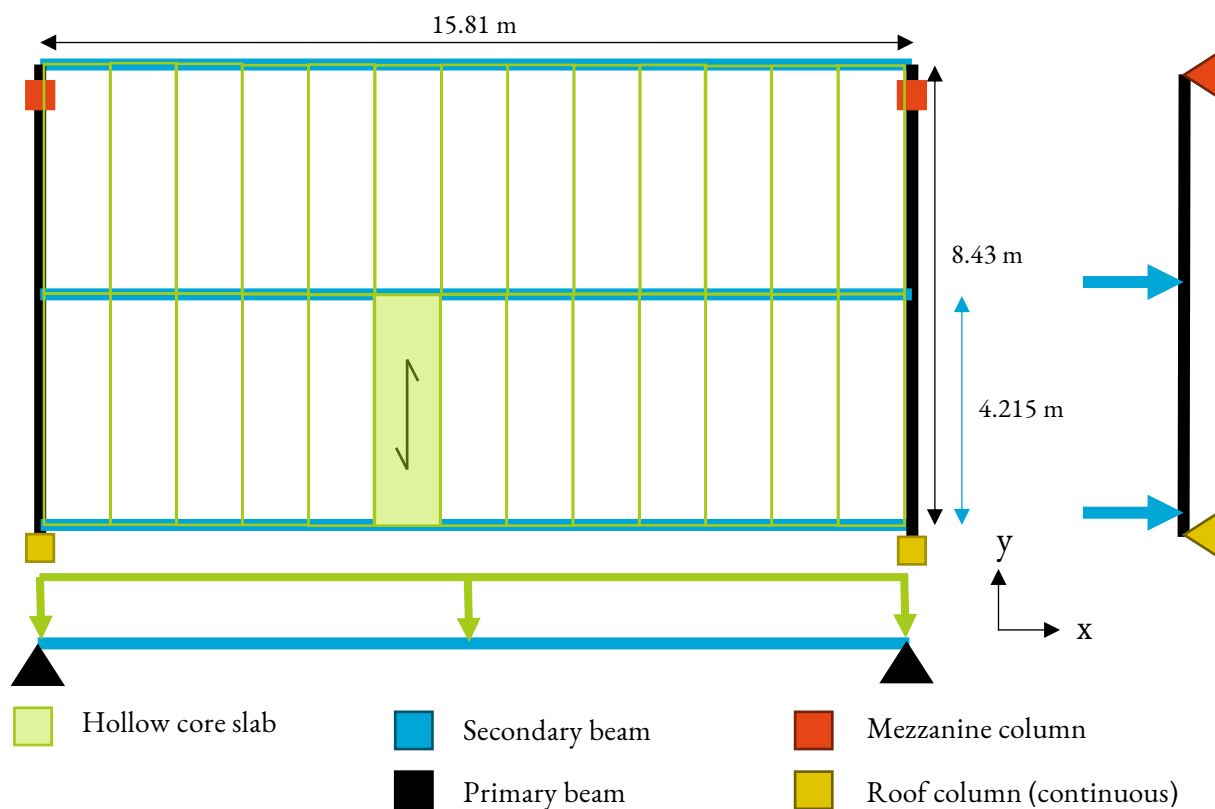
Chosen mezzanine floor layout for Alternative B
